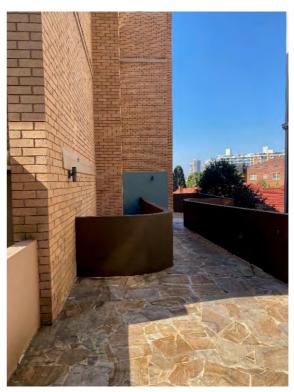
Crazy paved path to main entry on the southeast elevation with cast concrete balustrades.
